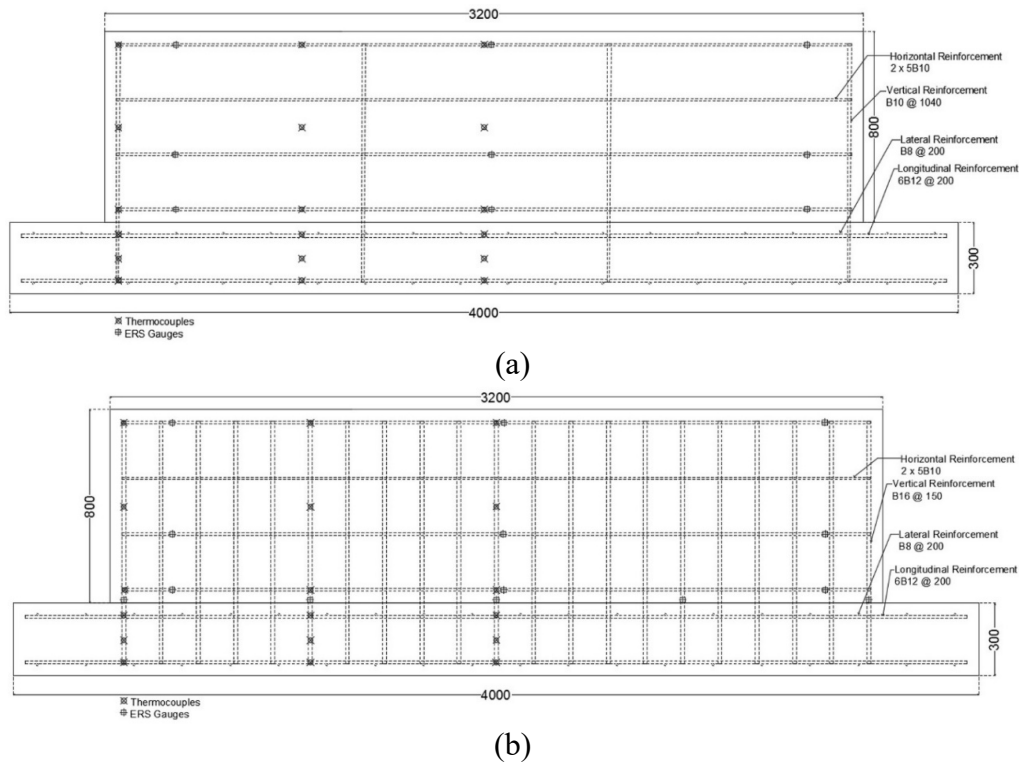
Geometric and reinforcement details of tested walls: (a) Test 1 & 3; (b) Test 2 & 4 (all dimensions in mm)
